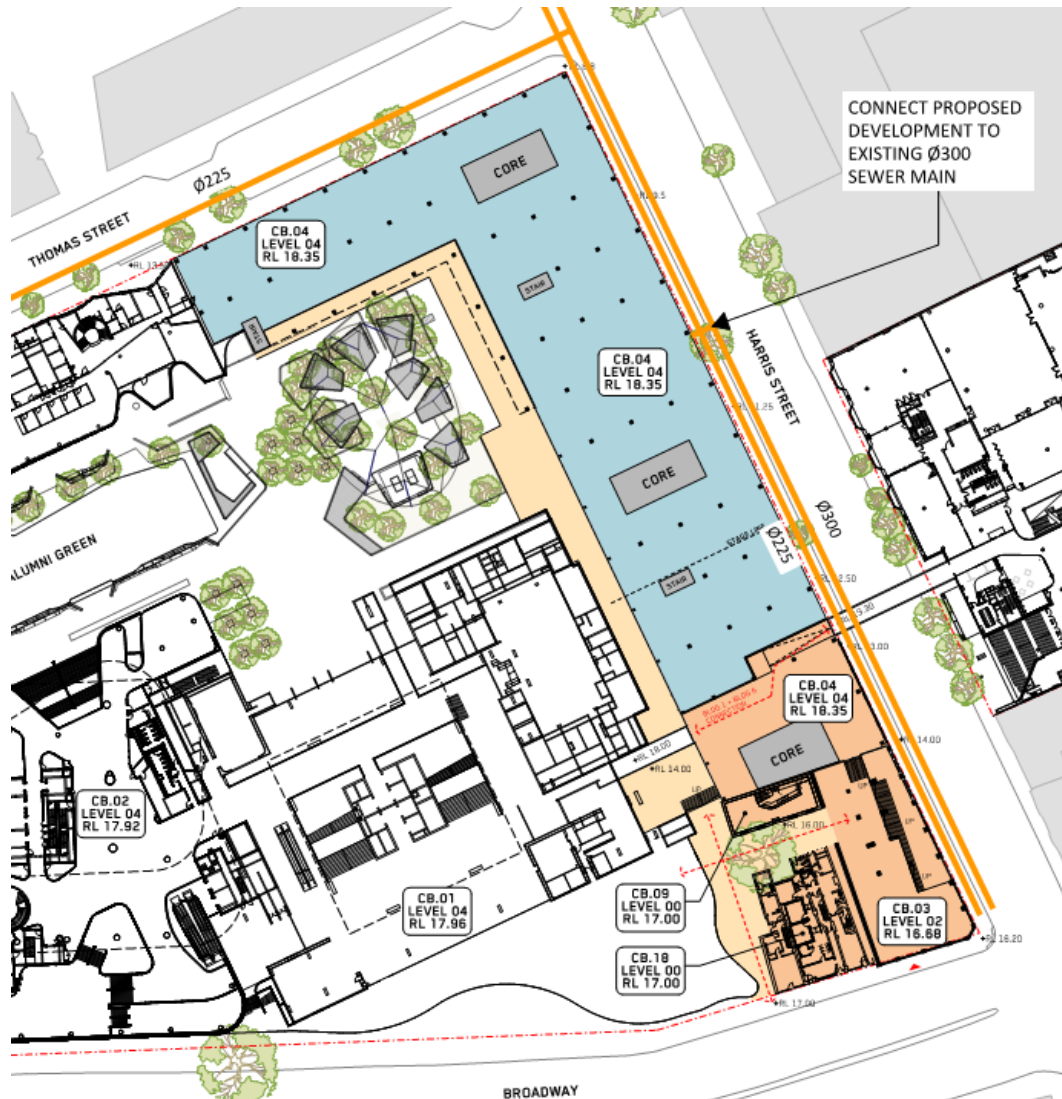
Existing Sewerage Infrastructure and Proposed Sewerage Servicing Strategy
